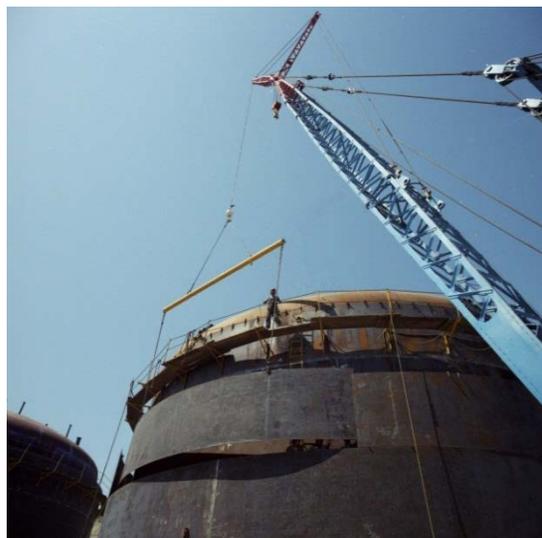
Secondary Liner Wall Erection (Photo 8405415-37cn) (Taken 8/1/1984)
